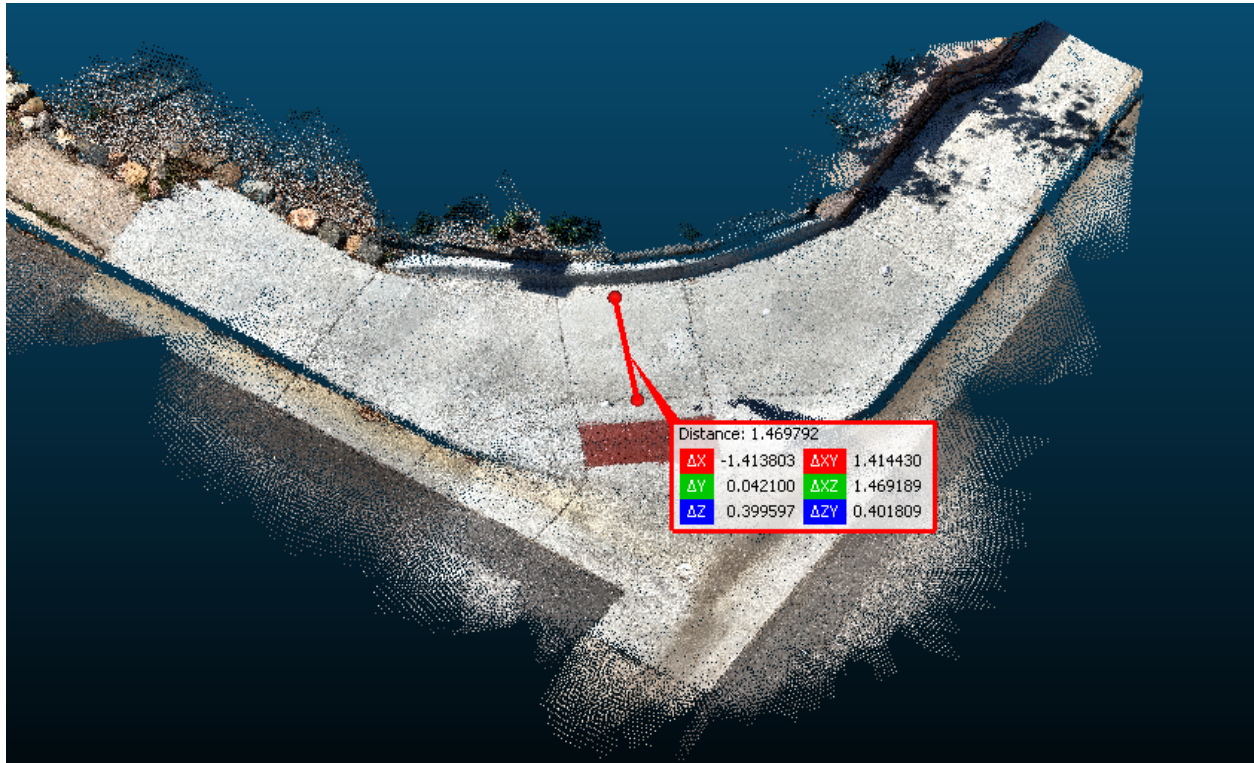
iPhone Point Cloud Dataset 29th Avenue and Elm Street Curb Ramp
